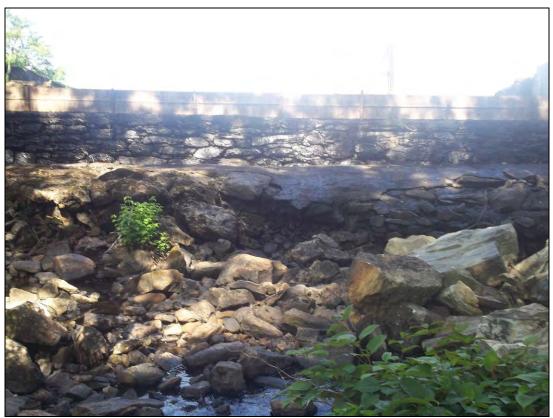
Overview of spillway from downstream (tailrace or channel area)
